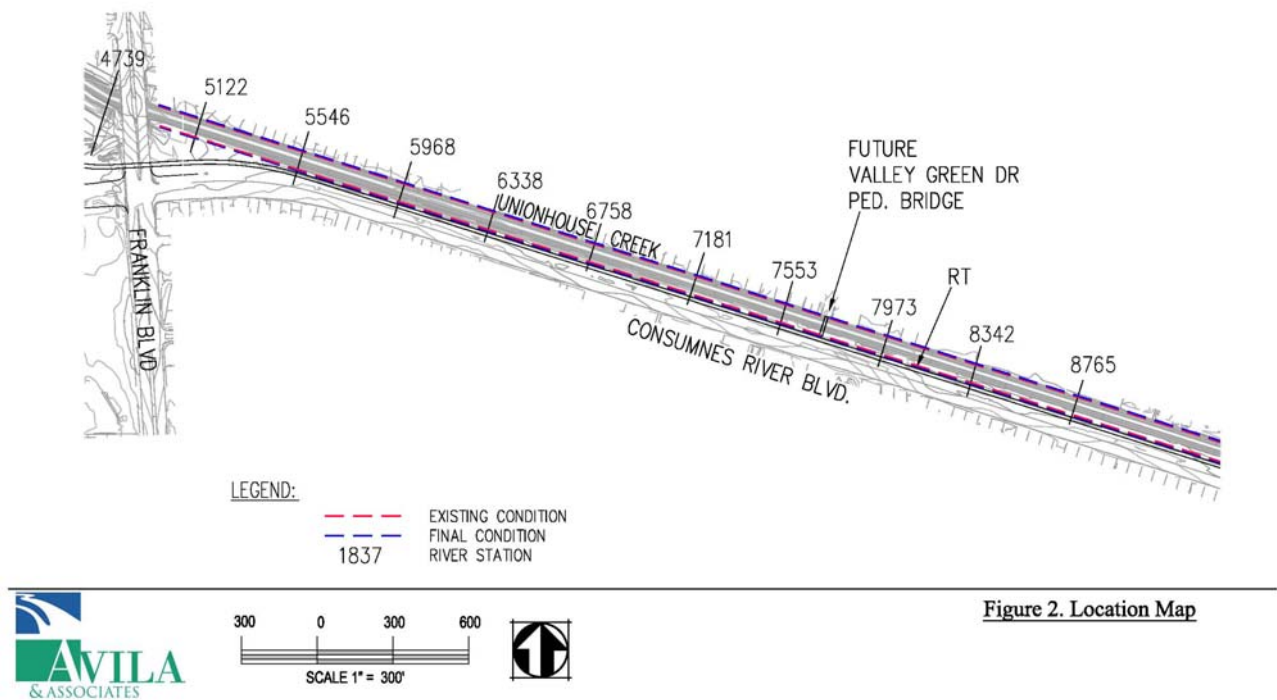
Plan view of HEC-RAS Cross sections for Franklin Blvd to Valley Green Pedestrian Bridge
